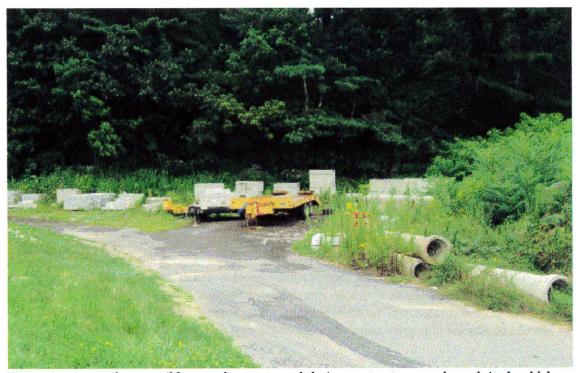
An easily accessible area for storage of drainage structures and conduit should be maintained in the proposed new facility.
